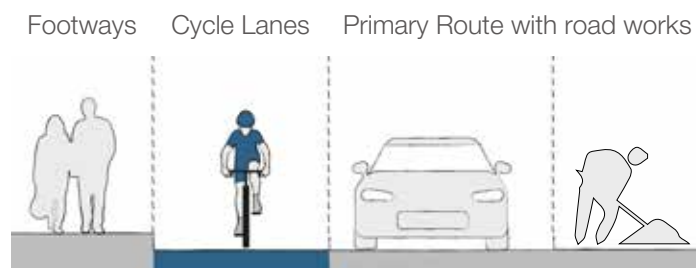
Cycling lane to be provided while road works are undertaken.
